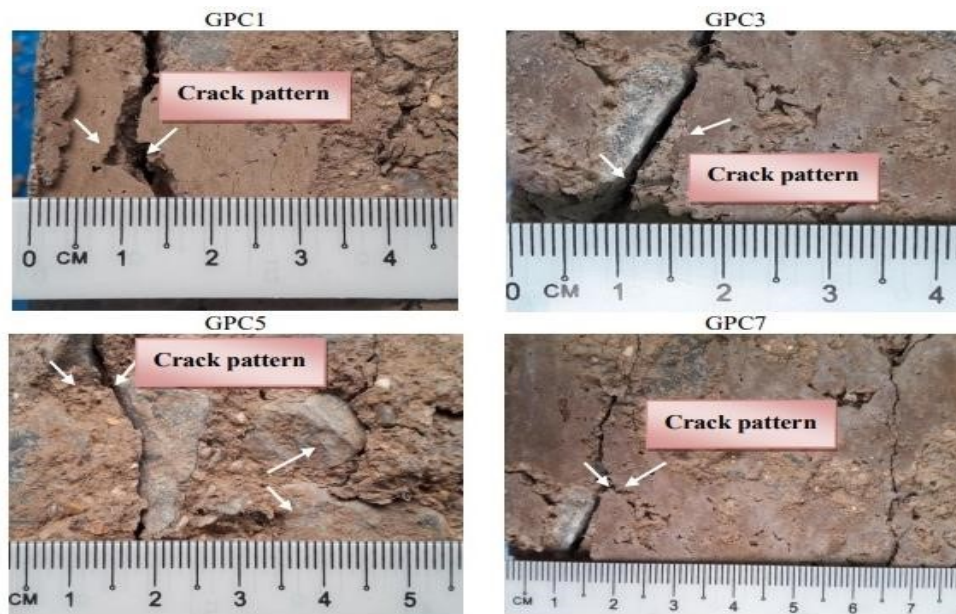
Crack patterns for geopolymer concrete structure after compressive strength testing.
